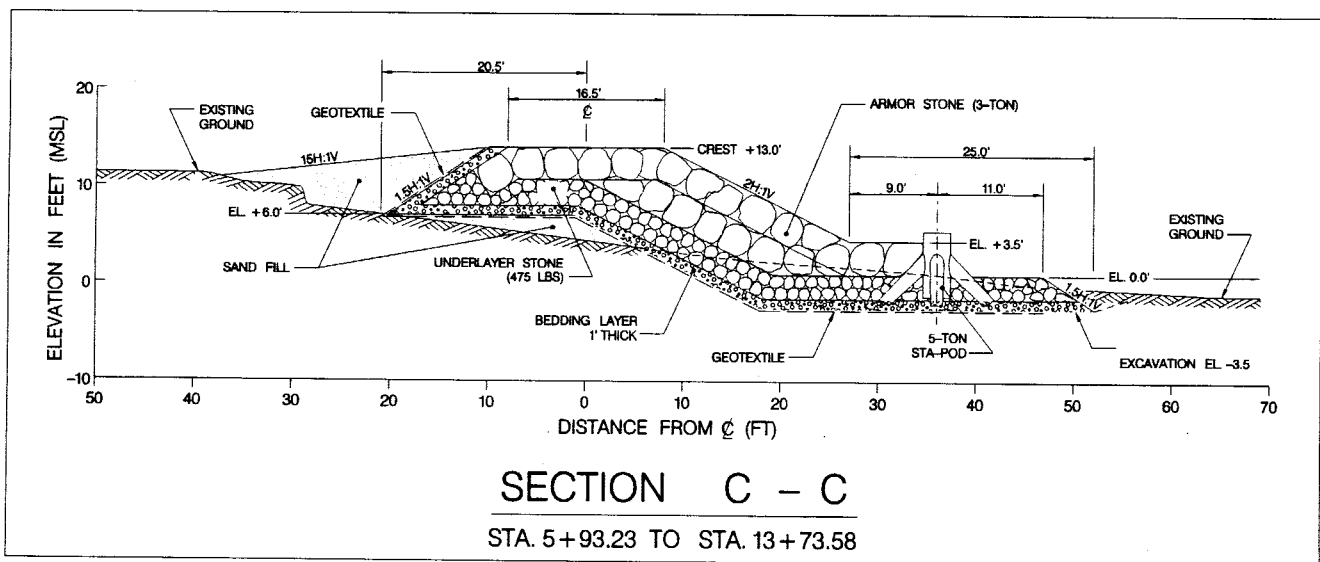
Typical revetment x-section showing various stone layers and position of STA-POD units.
